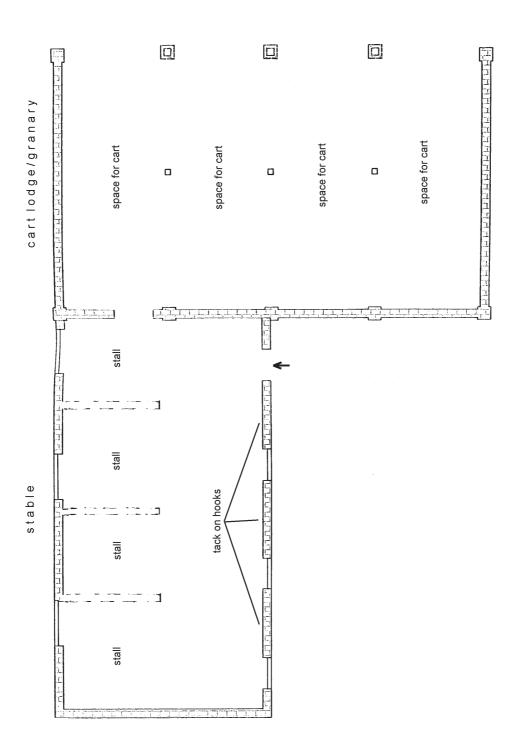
Cart lodge/granary and stable: ground-floor plan as originally used.
